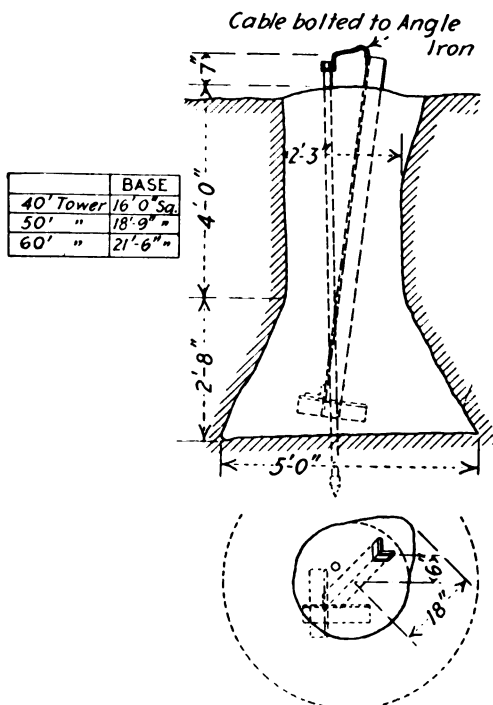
PENNSYLVANIA WATER AND POWER CO. CONCRETE FOUNDATION FOR HEAVY TOWERS
